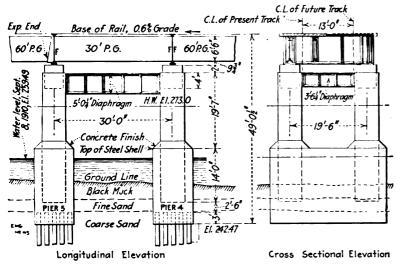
Cylinder Pier Construction for the Oxford Mill Pond Bridge (Wisconsin); Chicago & Northwestern Ry.
